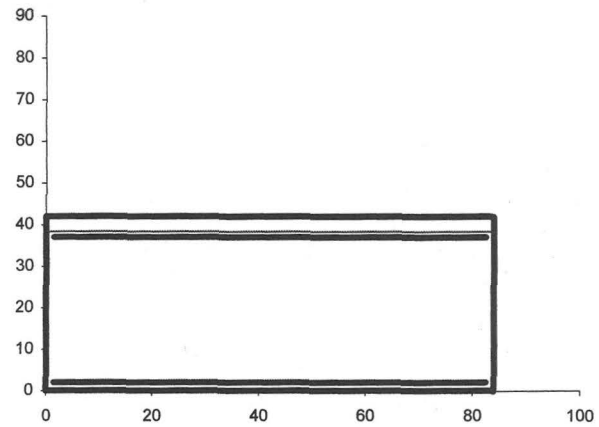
Beam cross-section with Whitney's stress block and reinforcing.
